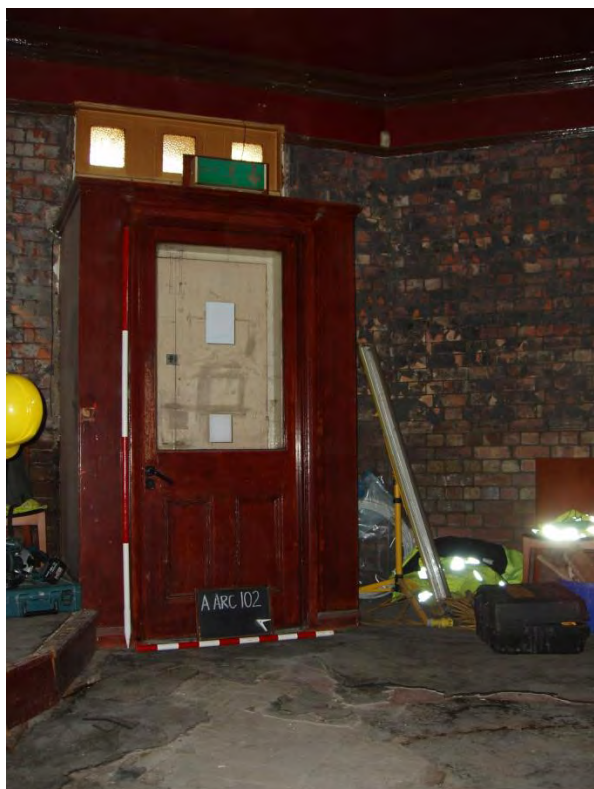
Internal East Facing Elevation Showing Original Door Frame and Knocked Through Access in Foreground (Scales 1 x 2m & 1 x 500mm)
